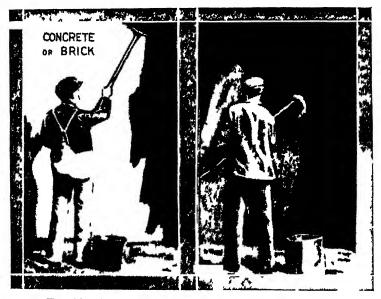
Damp-Proofing the Outside of a Cellar Wall.
